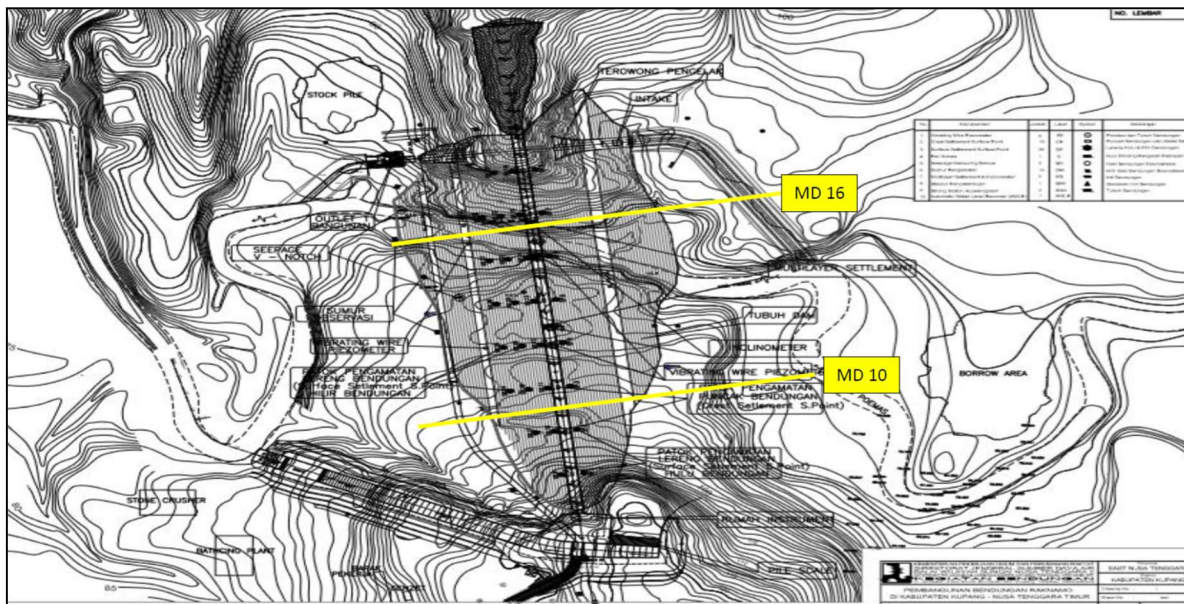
Layout of 2 section piezometer, MD 10 and MD16.
